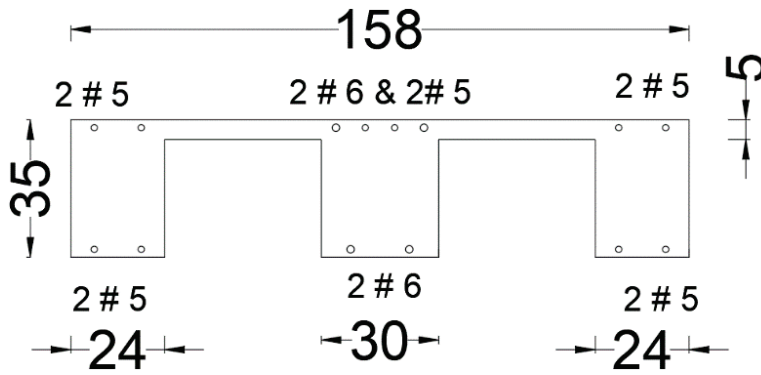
Dimensions (in units of cm) and reinforcement configuration of a typical beam element.
